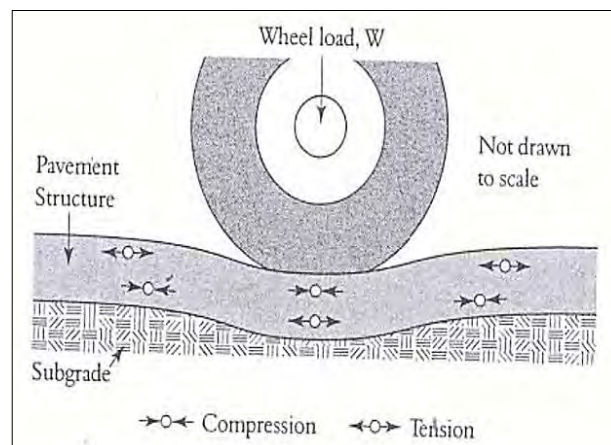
Compressive and tensile stresses in the asphalt pavement structure (Al-Rousan 2016)
